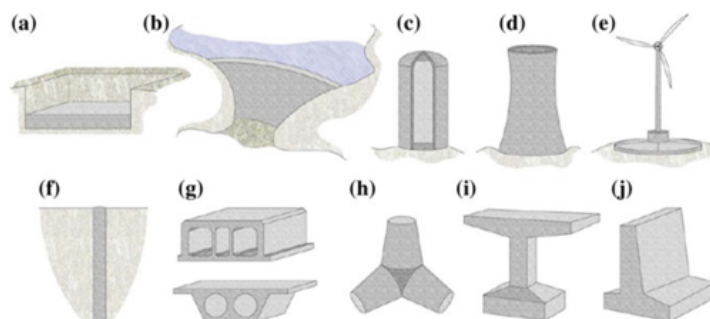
Examples of concrete structures that can benefit from thermal simulation: (a) foundation slabs; (b) concrete dams; (c) silos / containment structures; (d) cooling towers; (e) wind turbine foundations; (f) stakes; (g) precast segments (top: current artwork (culvert), below: special artwork deck (bridge/viaduct)); (h) tetrapod blocks; (i) mesostructures of special works of art; and (j) retaining walls. [5]
